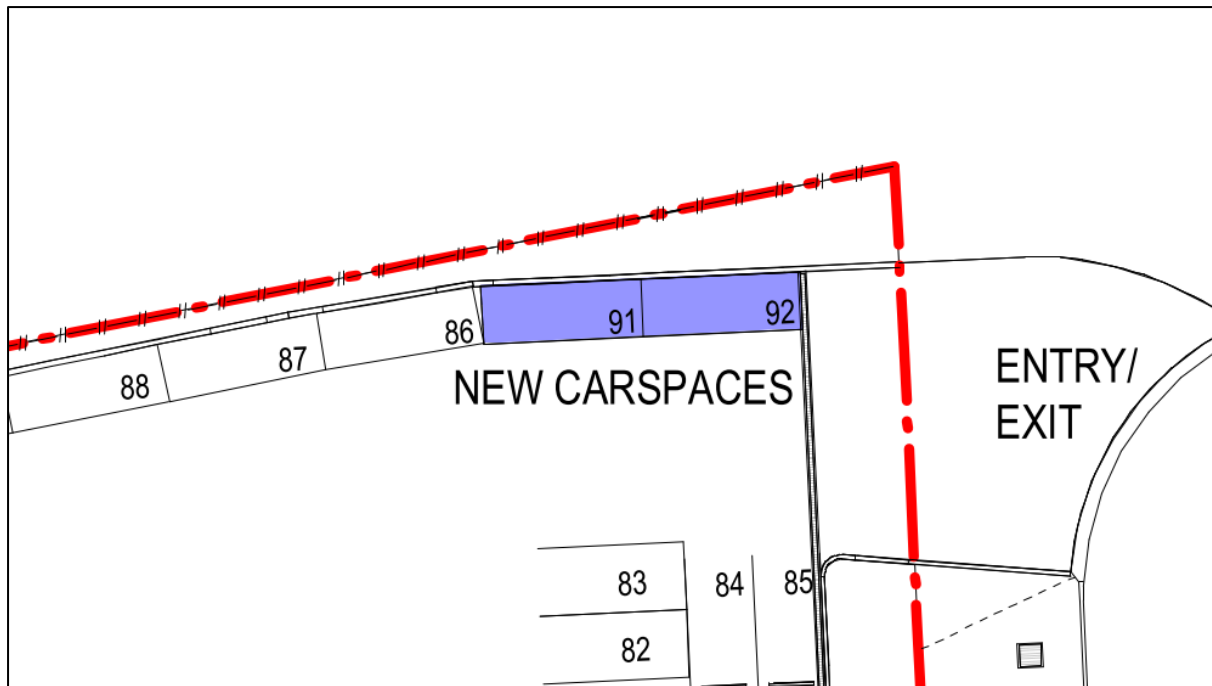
Extract of the proposed site plan showing the proposed two new parking spaces.
